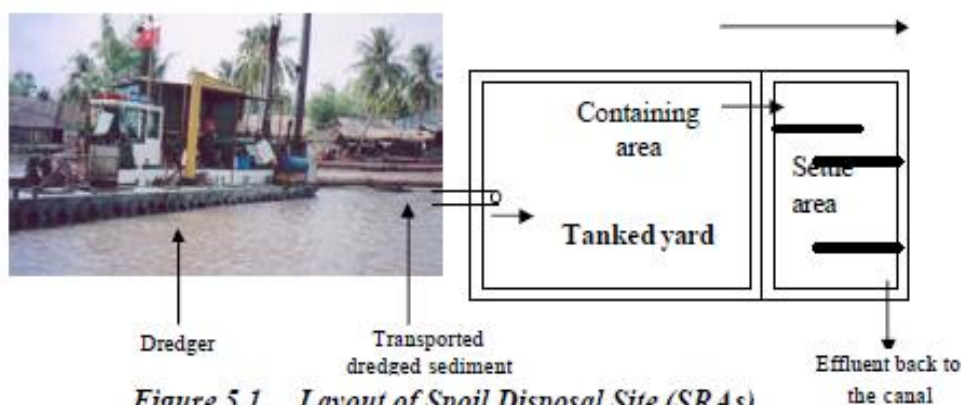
Layout of Spoil Disposal Site (SRAs)
